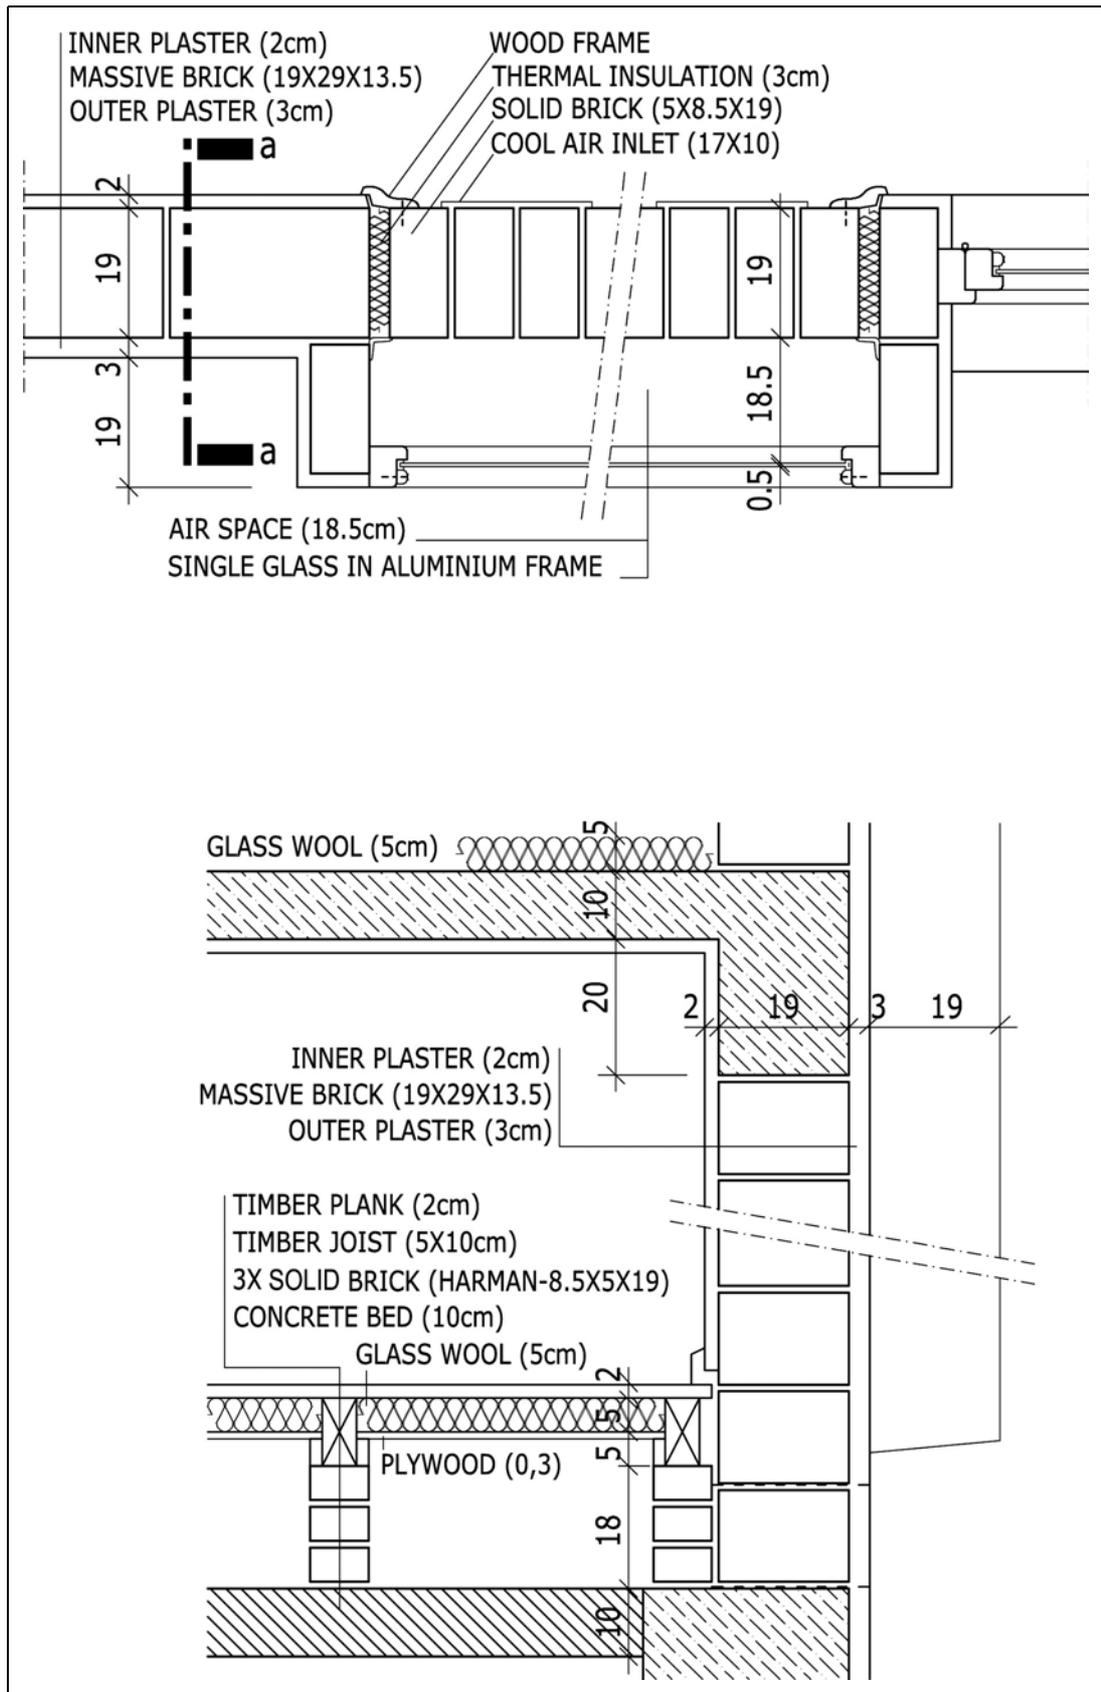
Two details specific to the sample dwelling made of load bearing (massive) brick: plan of the Trombe Wall and the system section including the suspended ground floor and the roof floor, and the outer wall; Scale 1/10
